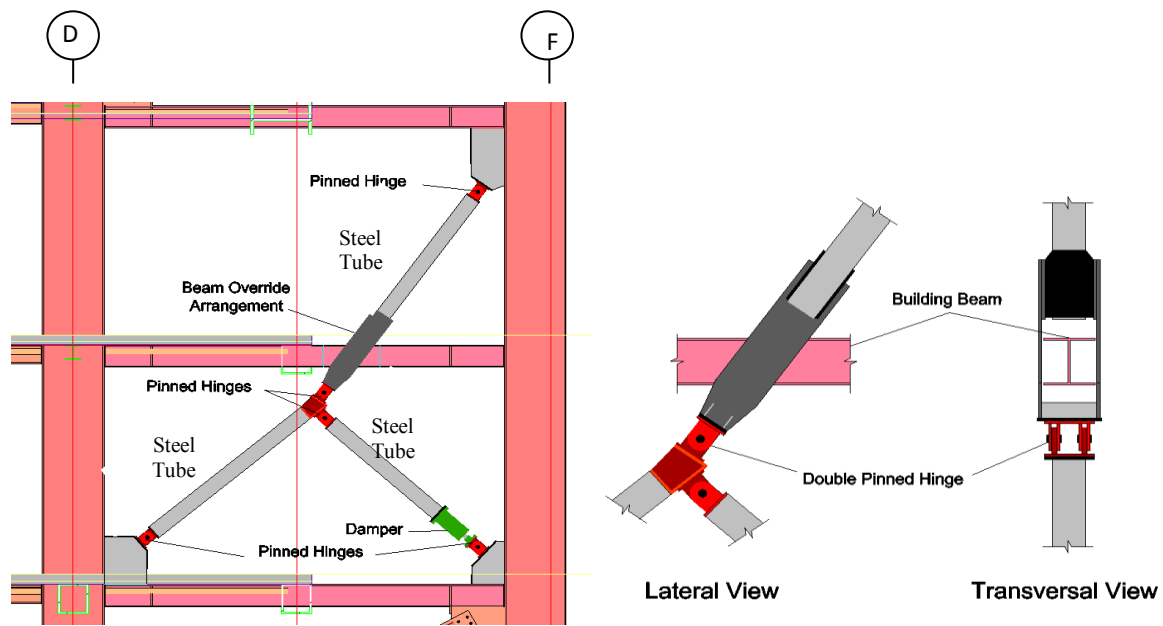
Typical toggle brace and damper connectivity layout and beam override arrangement
